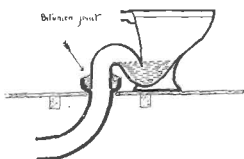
Showing method of connecting a pan to a drain pipe.
